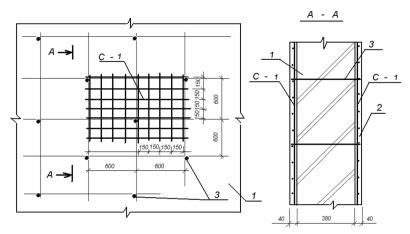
Scheme of strengthening 380mm thick brick walls: 1-existing brick wall; 2-M100 large sand-cement plaster; 3. A-II class rods with a diameter of 10 mm connecting the reinforcement nets
